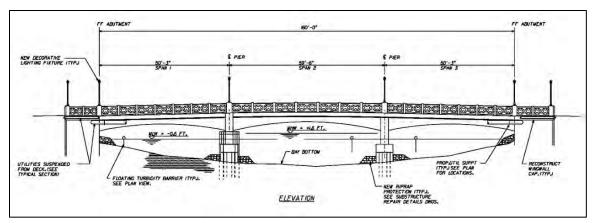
Venetian Causeway Bridge 7 (8DA14379), Elevation View
